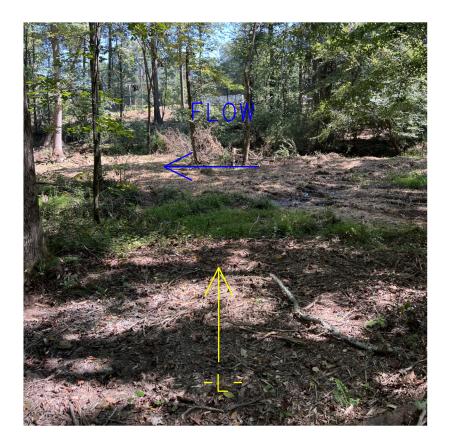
VIEW NEAR END BENT NO. 1, FACING UPSTATION
